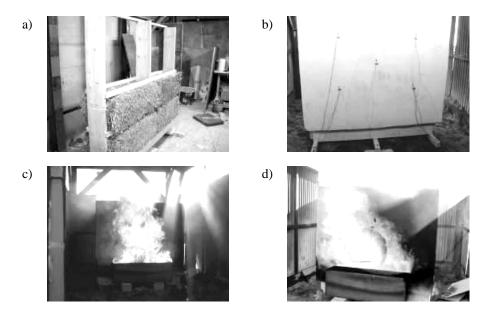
Wooden structure of a wall with baled straw filling (a), prepared wall for testing (b), wall exposed to fire load (c), the wall after cessation of fire (d)
